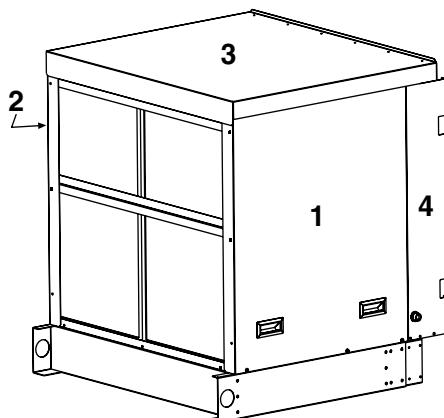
Evaporative Cooling Module Cabinet Components (Refer to Table 71)
